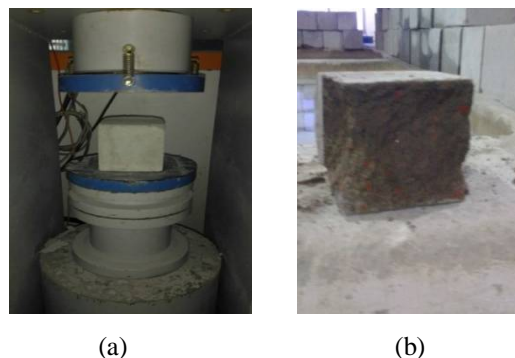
(a). Compression testing of specimen, (b). Crack pattern of specimen.
